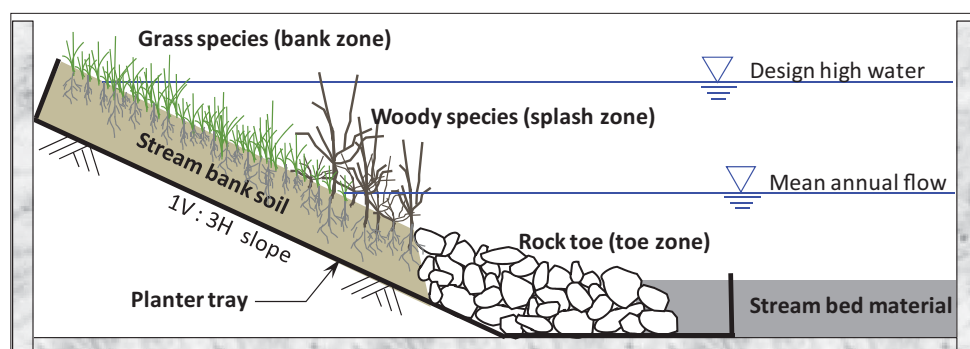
Typical bank-protection measure proposed for testing at CSU.
